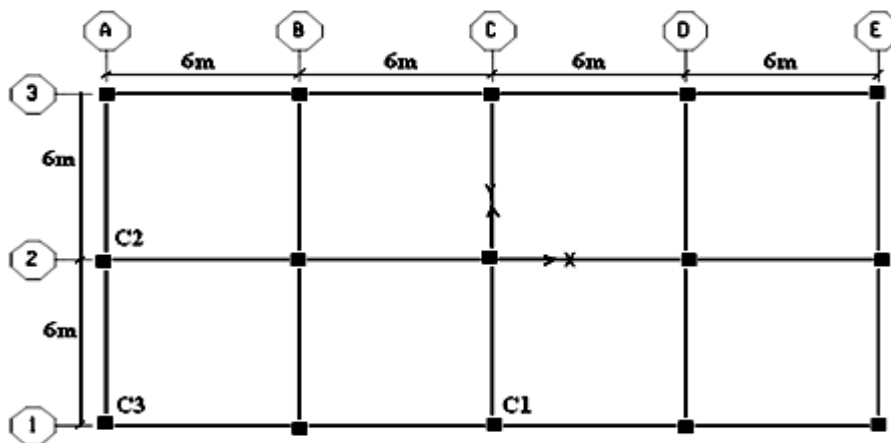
Reinforced Concrete Building Plan and Location of the Removed Columns.
